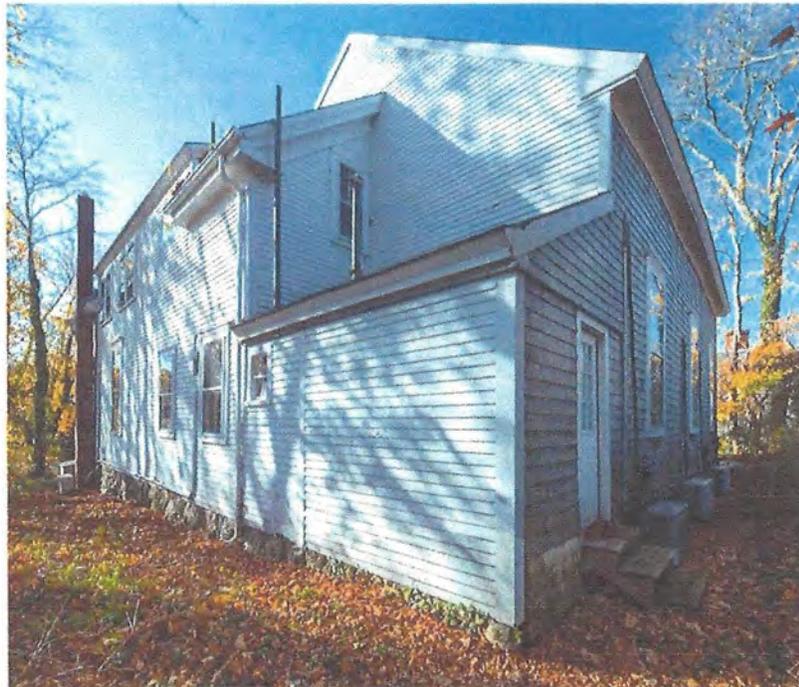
East Elevation (left) North Elevation (right) – November 12, 2018
